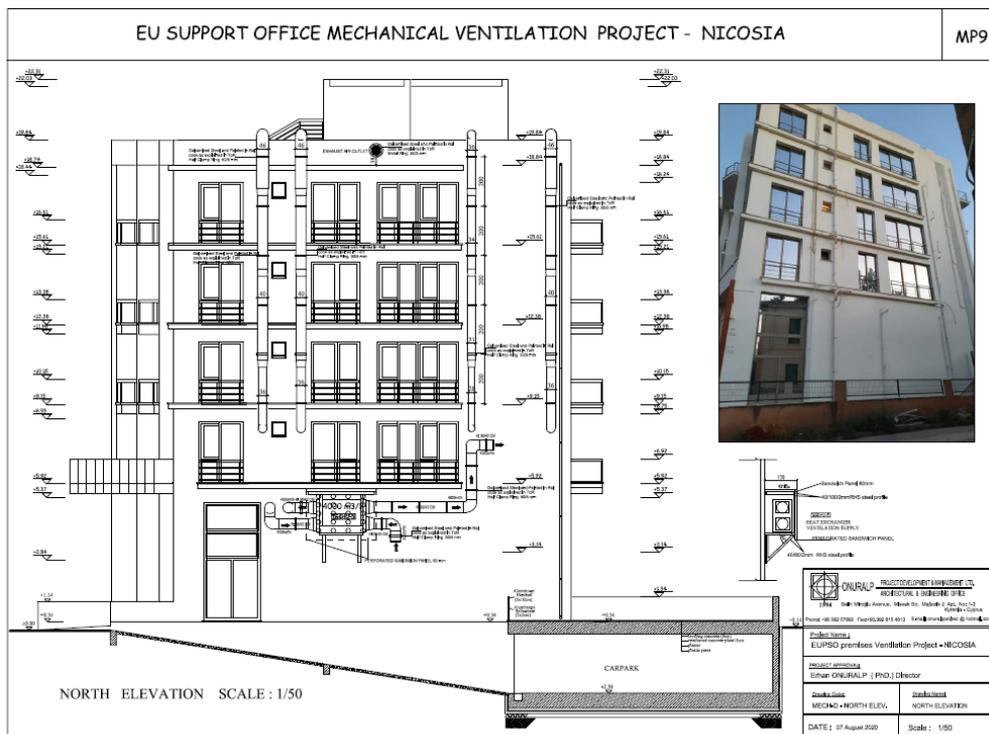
External Vertical Duct on North Facade planning – EUPSO project M9
